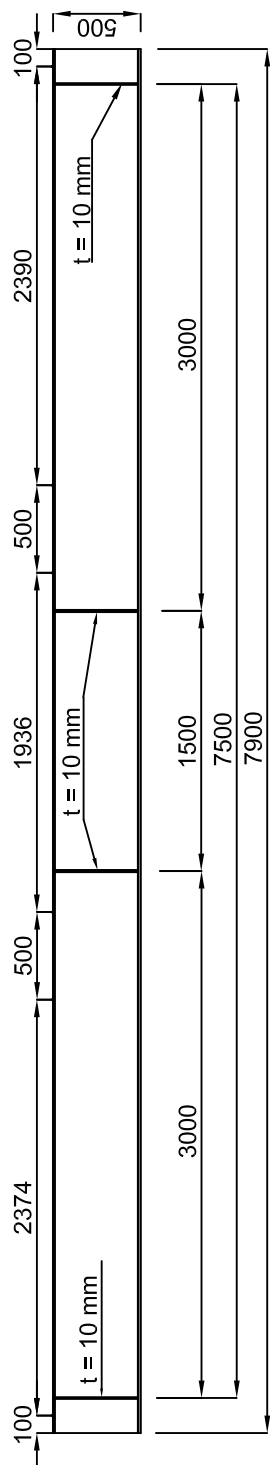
Elevation of steel girder with distance between the hard shims on the top flange. Deck type: ASSET
